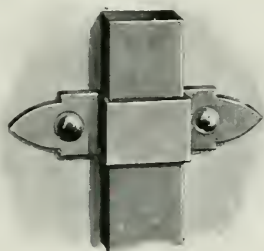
LIGHTNING ROD FASTENED TO A WALL BY A COPPER STRAP AND NAILS.
